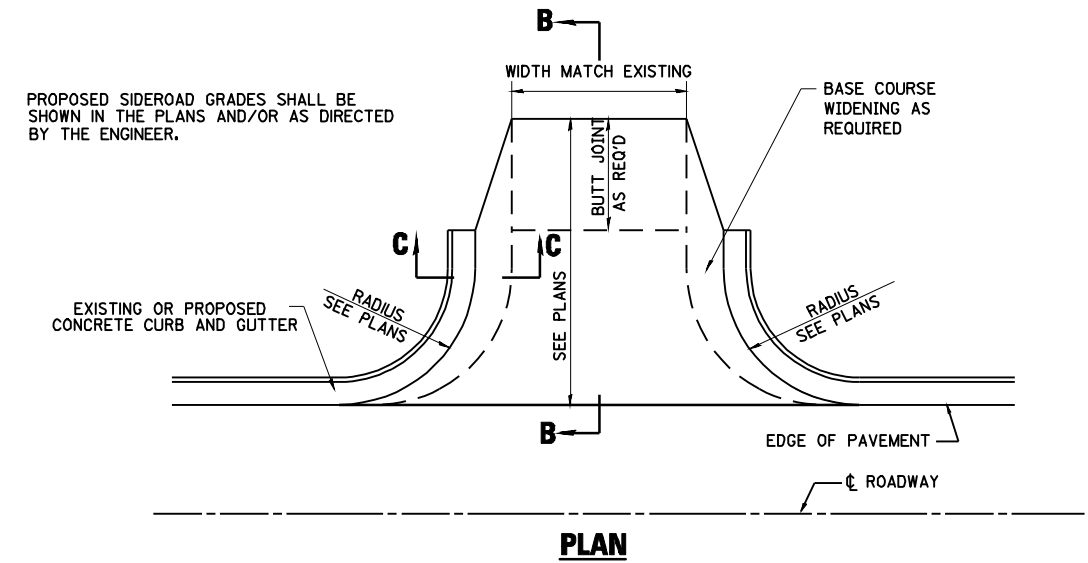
DETAIL A - URBAN SIDEROAD RETURN (REBUILDING)
